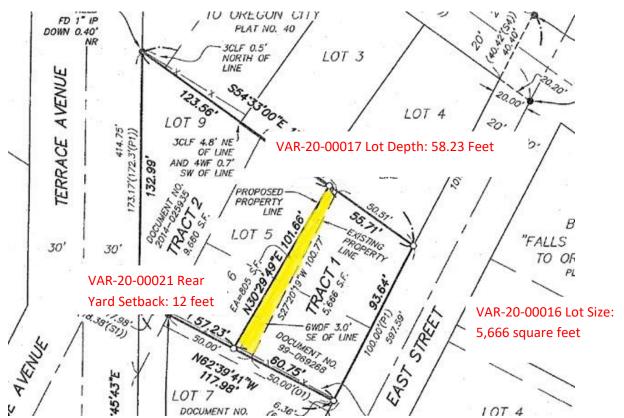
Proposed Lot line Adjustment (LL 20-006): Area in yellow is proposed to be transferred to Tract 1 (225 East Street) from Tract 2 (220 Terrace Avenue); the proposed Lot Line Adjustment dimensions for Tract 1 are in red with their associated Variance file #s.
